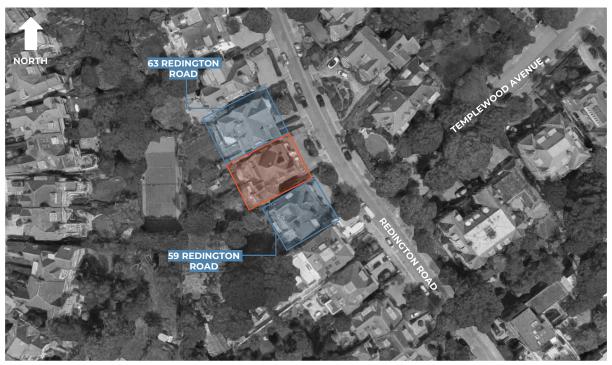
Site plan aerial view with the proposed development (red) and neighbouring buildings assessed (blue)
